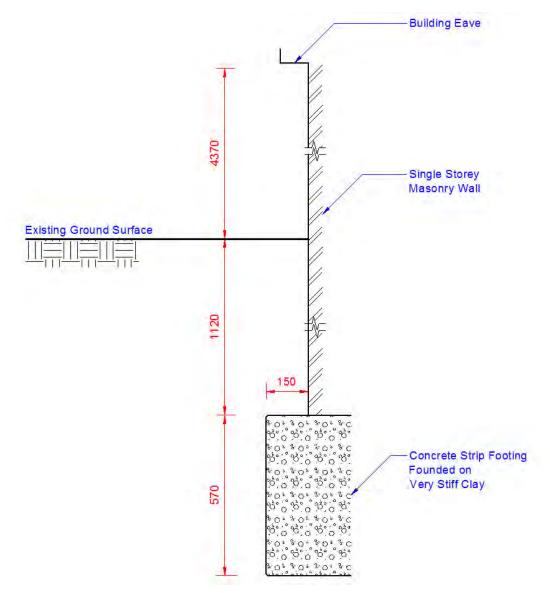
Summary of Existing Footing Geometry and Founding Conditions at Test Location 7
